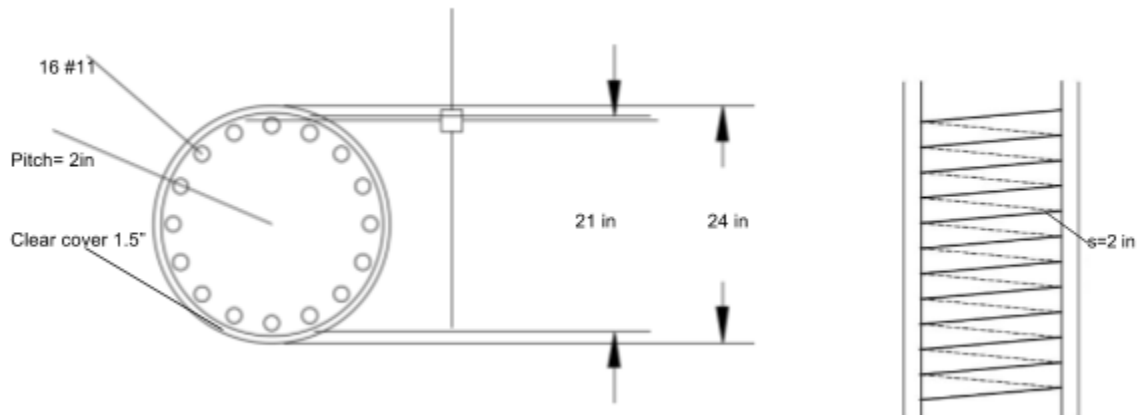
Column Dimensions. Cross Sectional View of Column F with rebars and dimensions (left), and profile view of column F (right).
